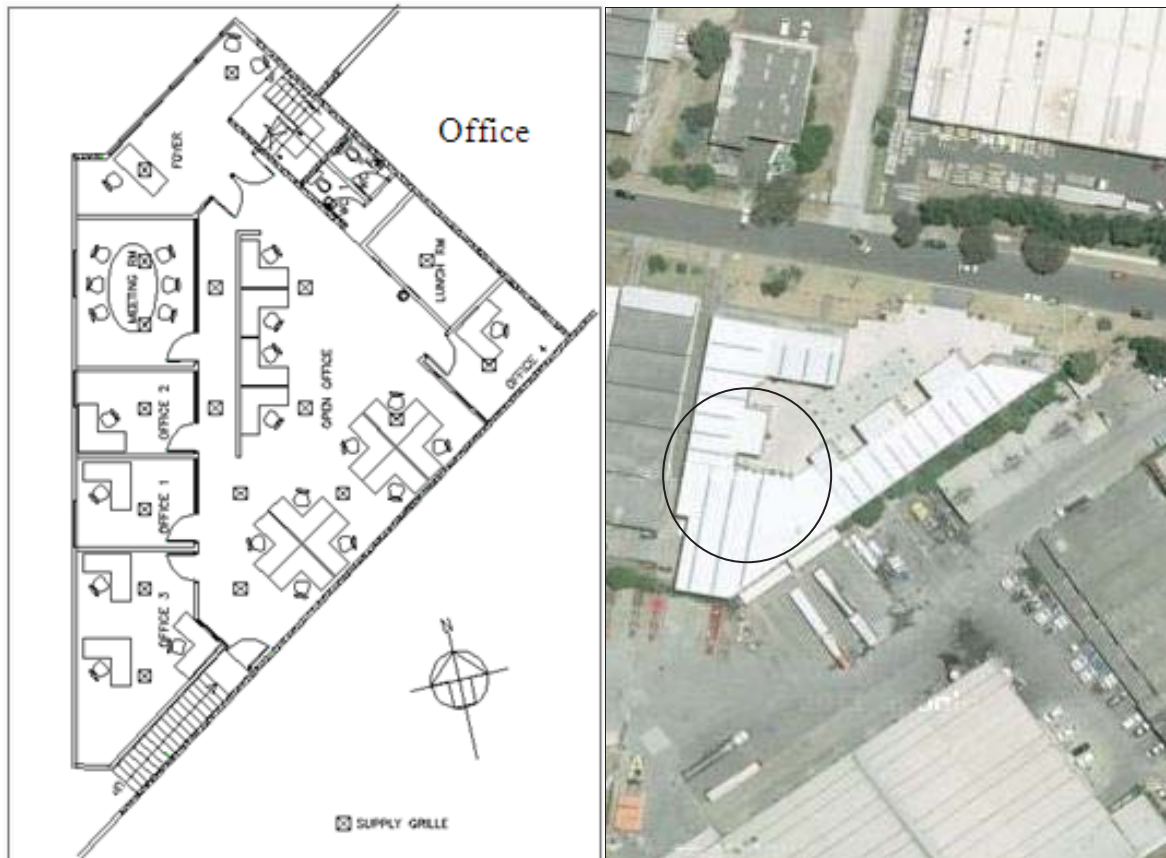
Office building plan and office building location on the map. (Source: Google Maps, 2013)
